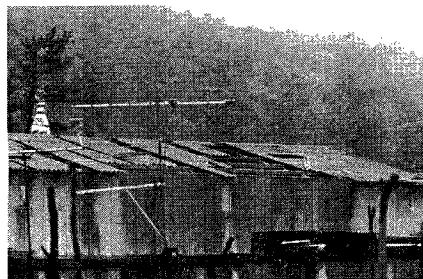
Damage to slate roof of a factory, Yanagi, SEKI.
